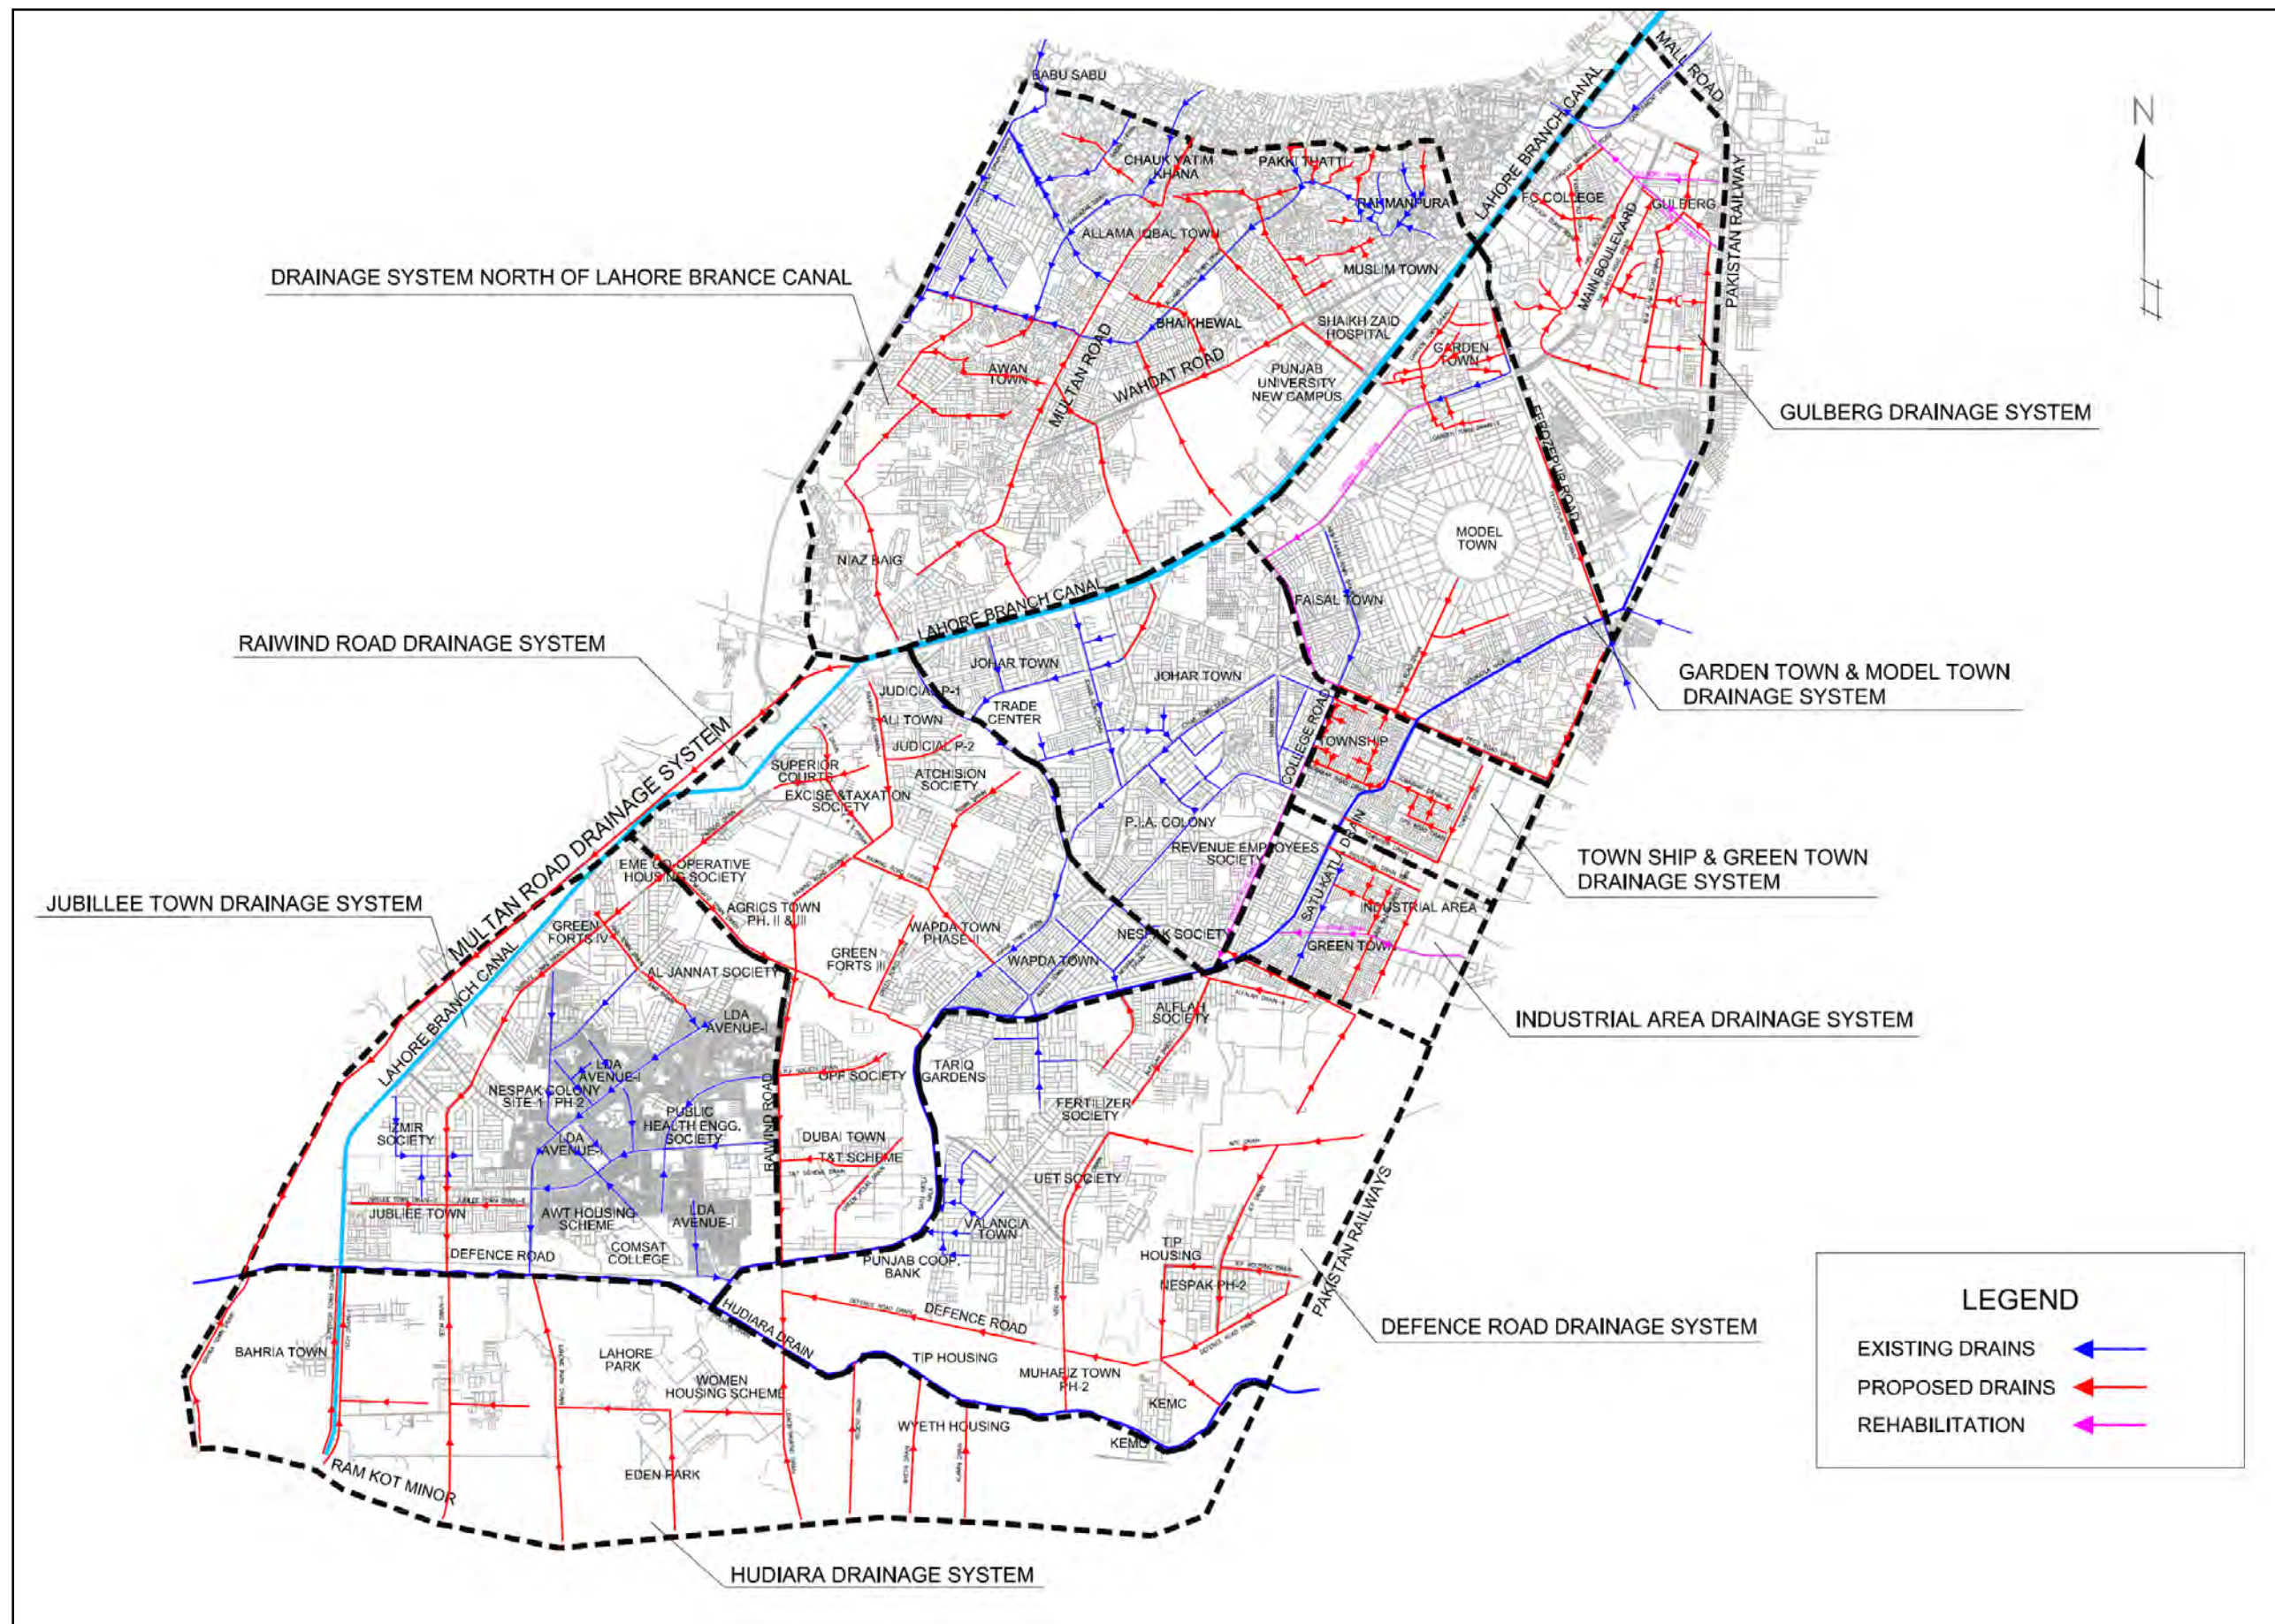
Plan of Proposed Drainage Facilities of Phase 2 Project
